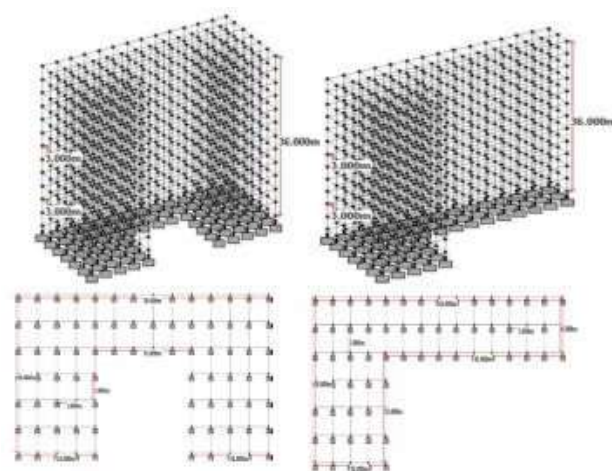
&3. 3DELEVATION AND PLAN OF C & L SHAPE OF BUILDING
